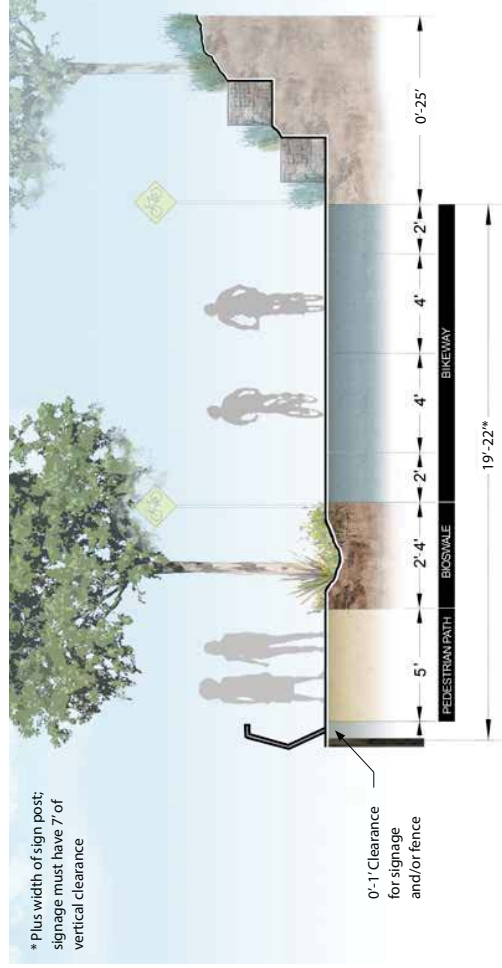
Kester Avenue to Van Nuys Boulevard - Typical Cross Section
